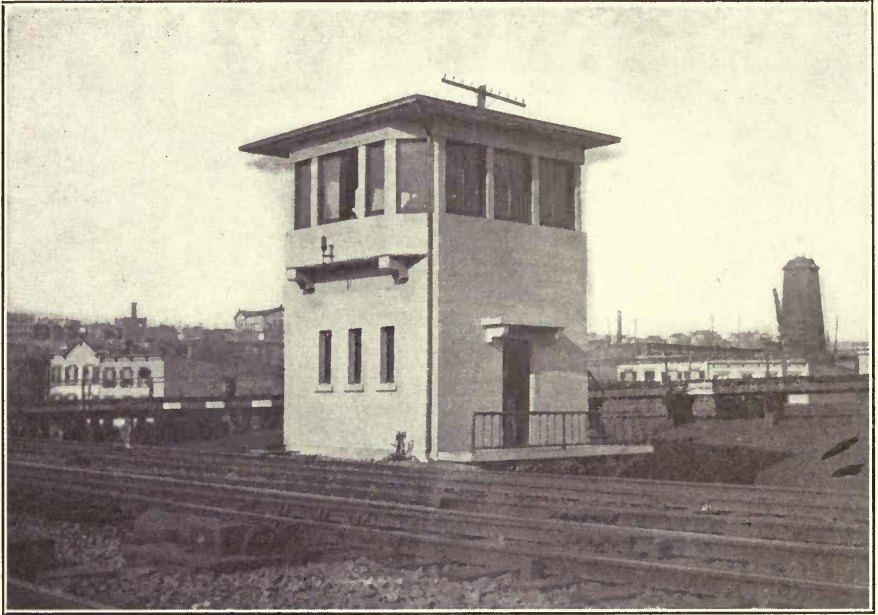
SIGNAL TOWER, GROVE STREET, HOBOKEN, D., L. & W. R. R.
